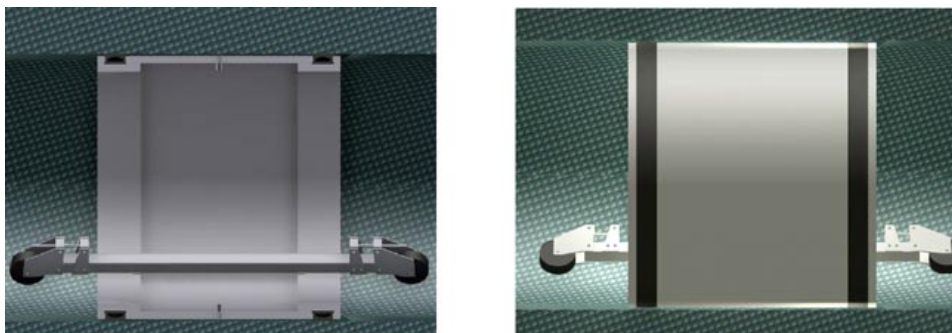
Mega-Packer grouting device, side view and cross section parallel to the drift.
